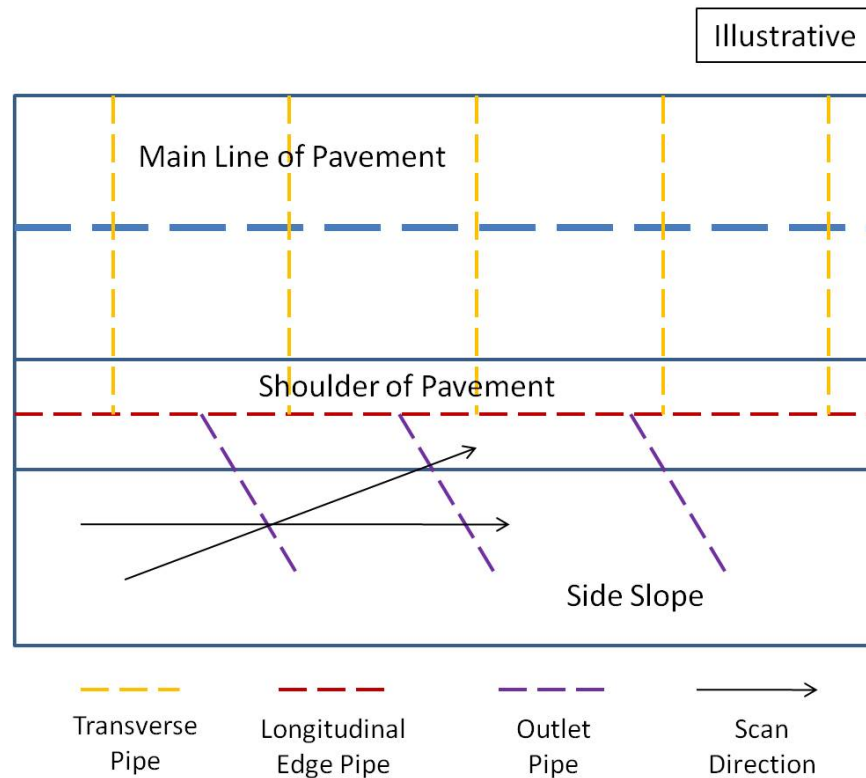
Schematic plan-view illustration of drainage system configurations
